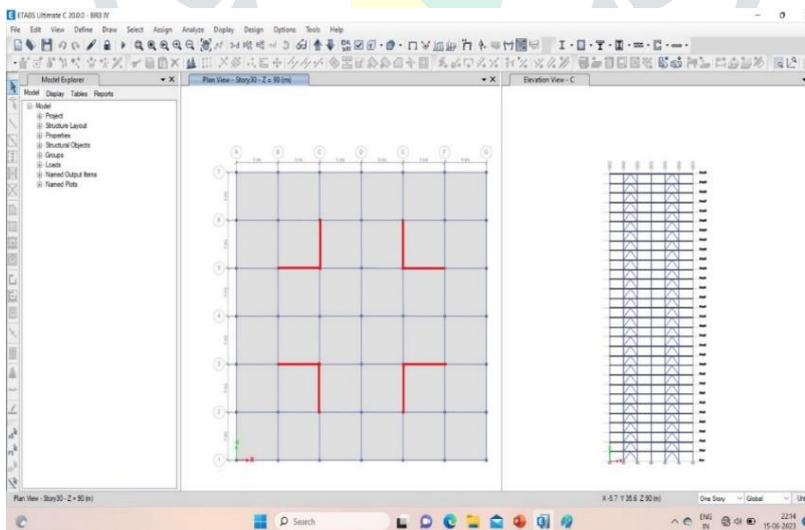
Diagrid building with inverted V-arrangement of secondary bracing.
